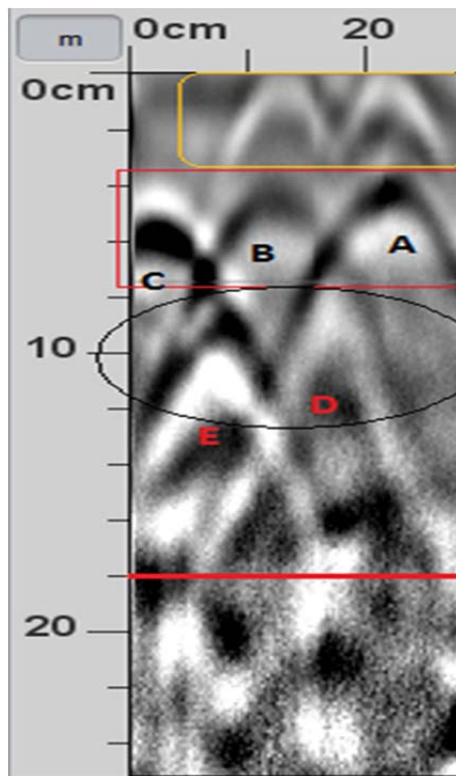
GPR profile of the rectangular block specimen test with strips inserted shortly after the first cracks were visible on the external surface
